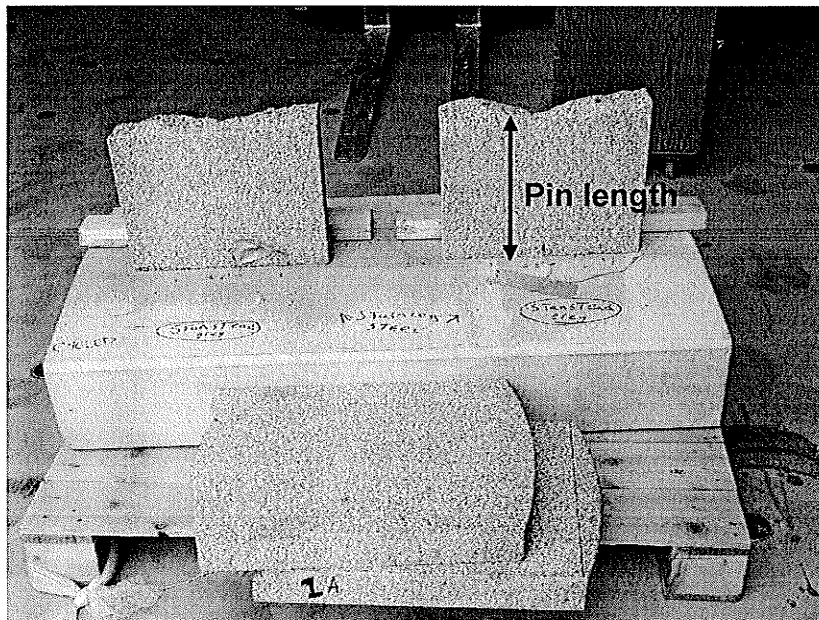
Failed stainless steel pinned specimens –marker failed just above end of mounting pin.
